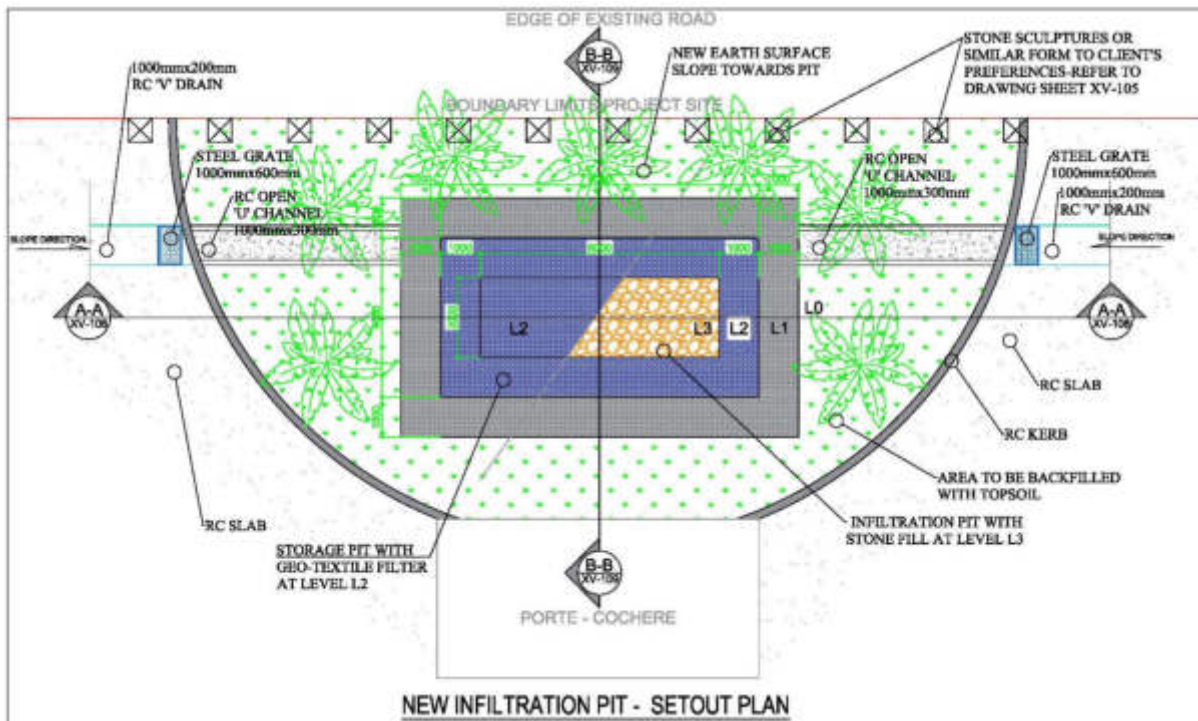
Typical Drainage structure plan (infiltration pit) in front of the building
